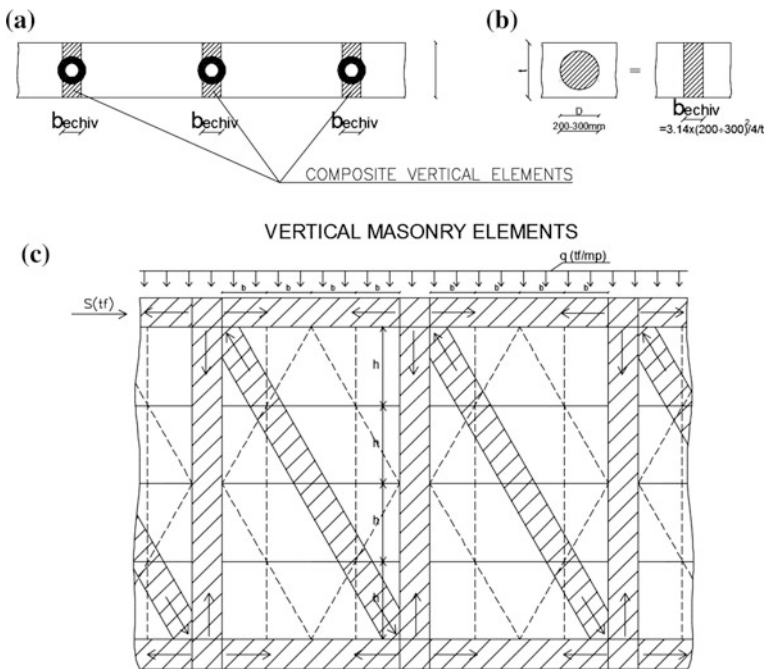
a Composite vertical elements. b Equivalence between R.C. bars and composite R.C. section. c Layout for vertical, horizontal and diagonal elements for a masonry wall with encased bars or reinforced concrete beams and columns
